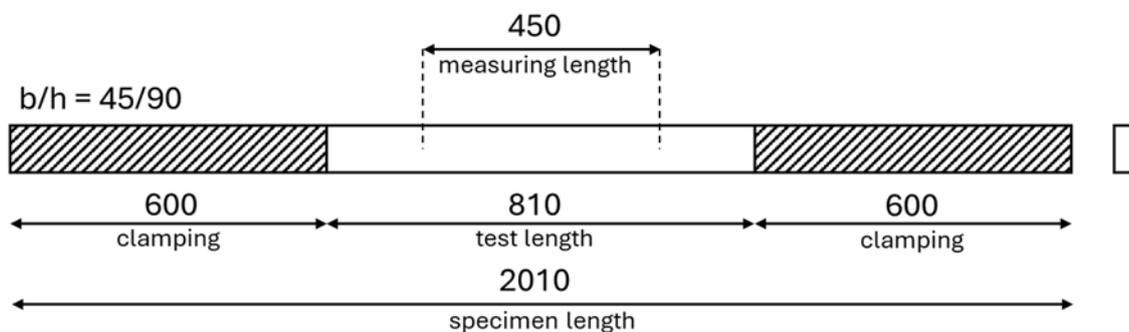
Test setup and dimensions of the tensile test specimens in [mm]
